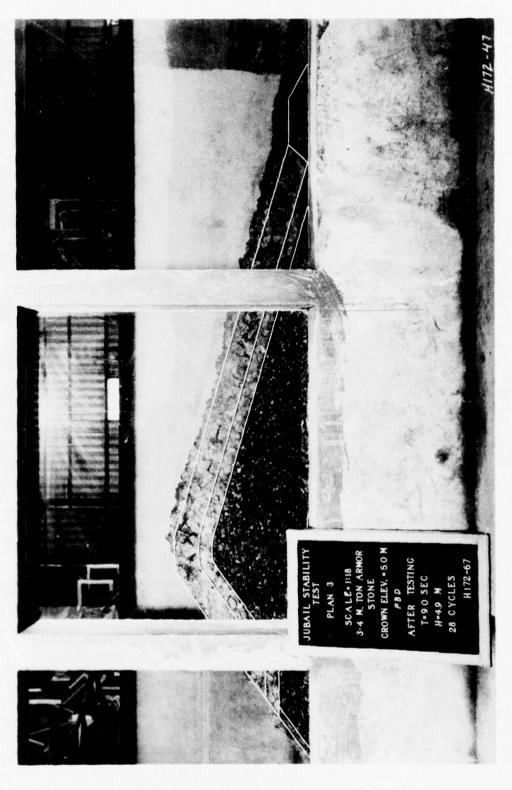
End view of Plan 3 after attack of 9-sec, 4.9-m waves at a swl of +2.35-m PBD
